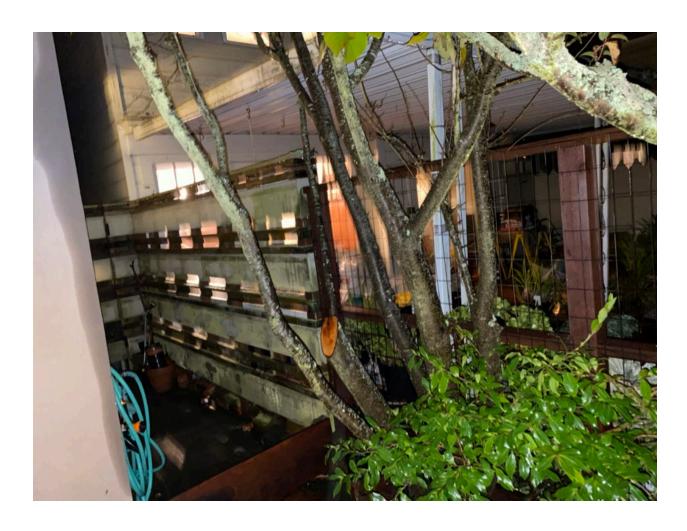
View from window at 679 12th looking southwest Note the accessory structure at 683
